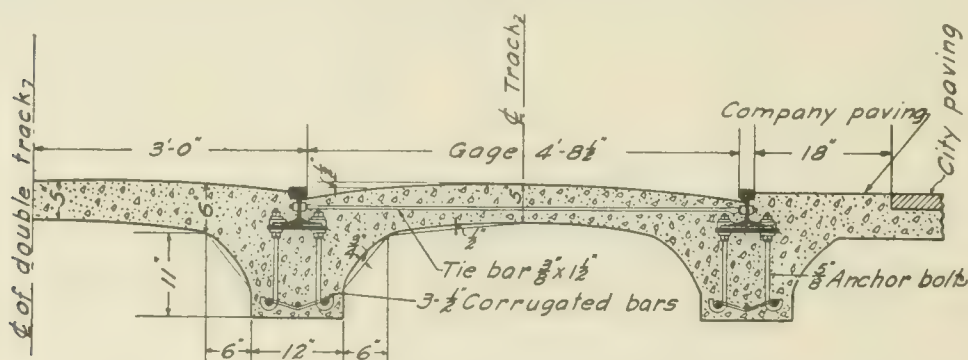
CONCRETE STREET RAILWAY TRACK CONSTRUCTION AT ANDERSON, N. C.
